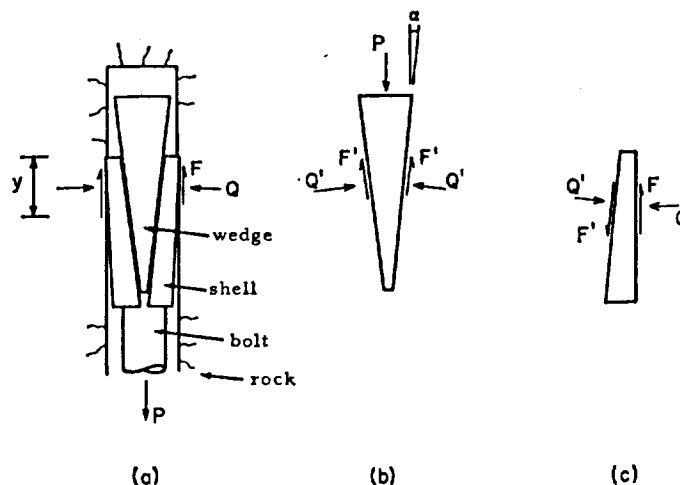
Mechanics of roof bolt anchorage, showing the forces between a typical wedge and shell, and between the shell and the walls of the hole.
